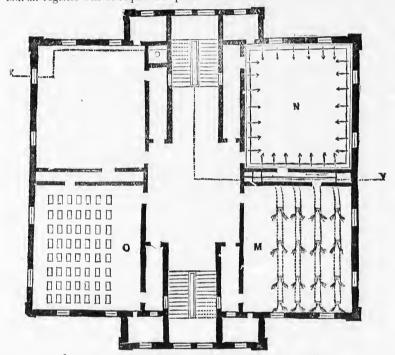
Plan of First and Second Floors of Ventilated School-House.
